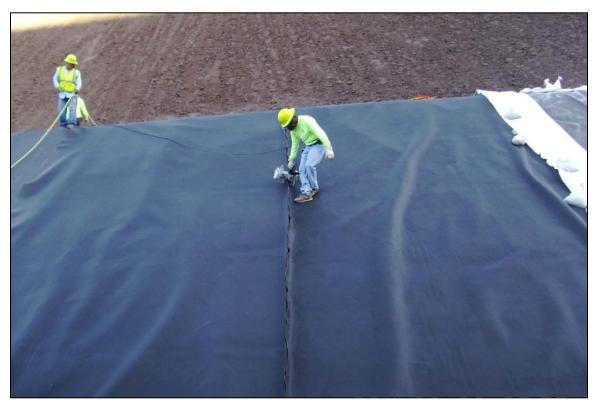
Sewing 16-oz geotextile on the northern repair area.
